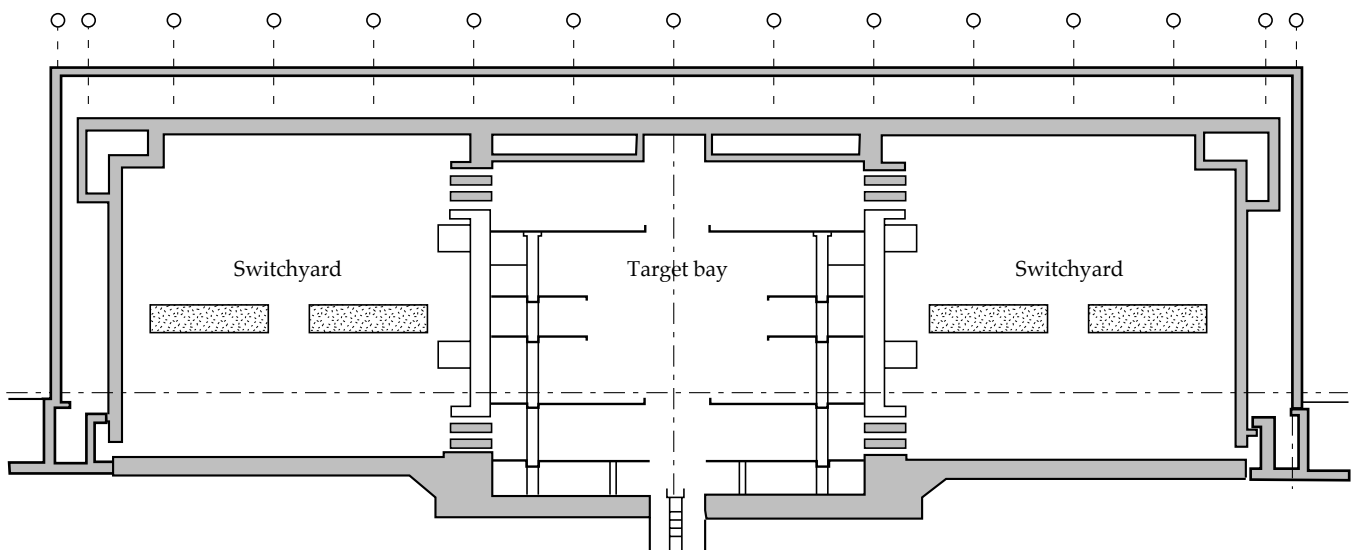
Shielding design. (40-00-1097-2231pb01)
